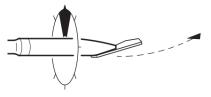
CLOCK POSITION DRILL HEAD AND STEERING PLATE
